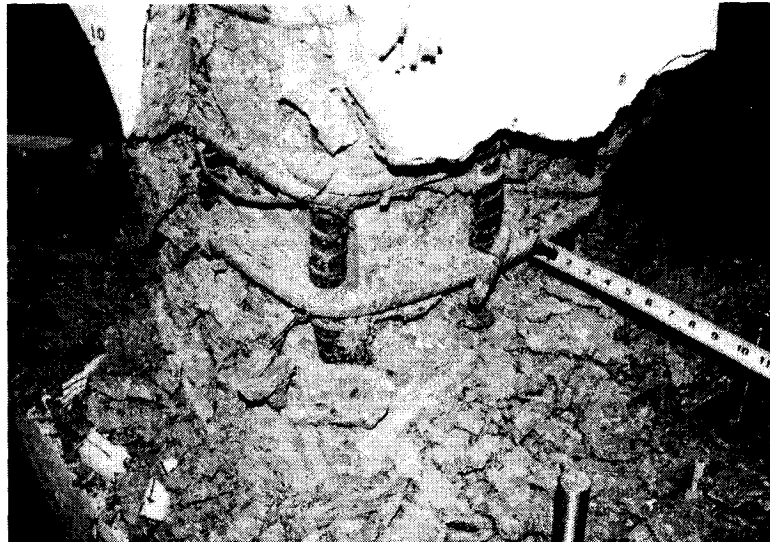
Failure of 90 degree anchorage of cross ties
